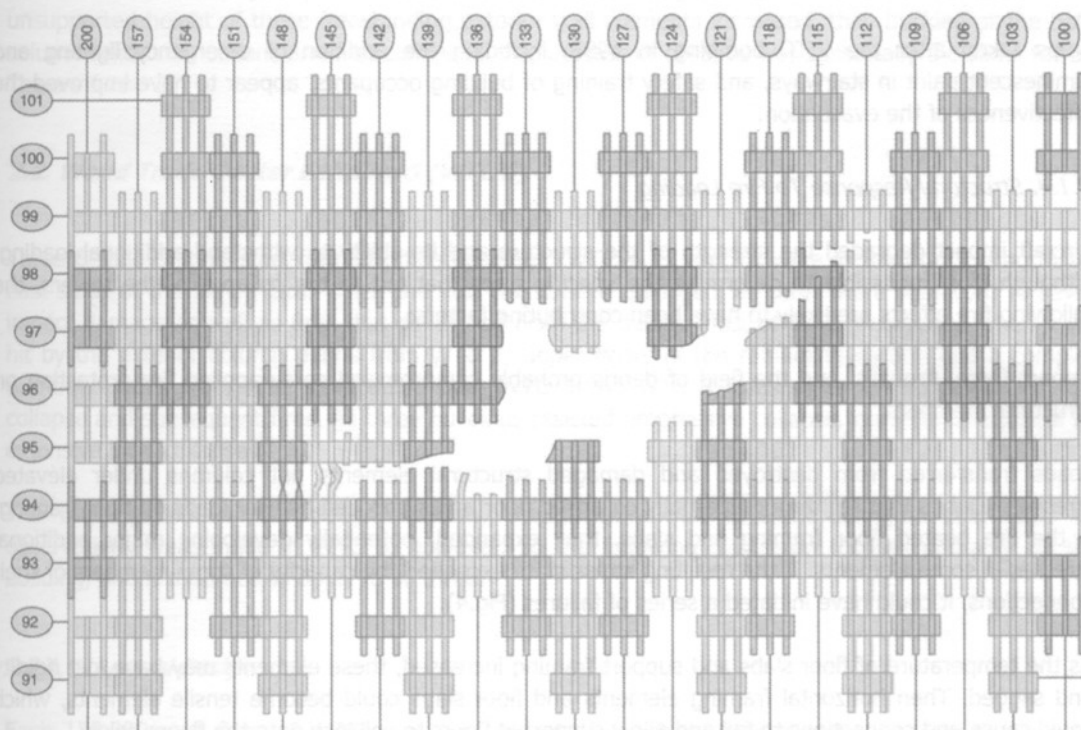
Impact damage to exterior columns on the north face of WTC1
